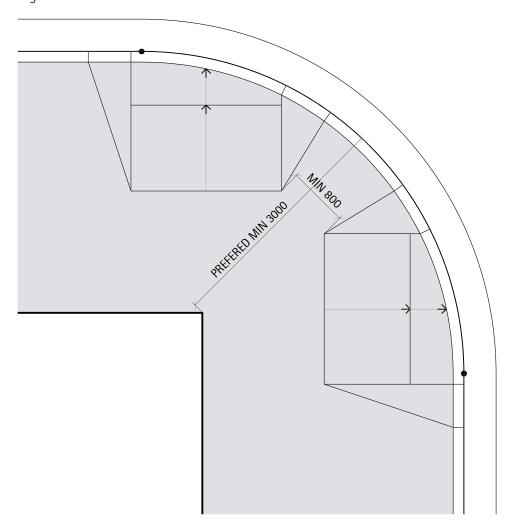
Kerb Ramp Arrangement Showing Minimum Distances
